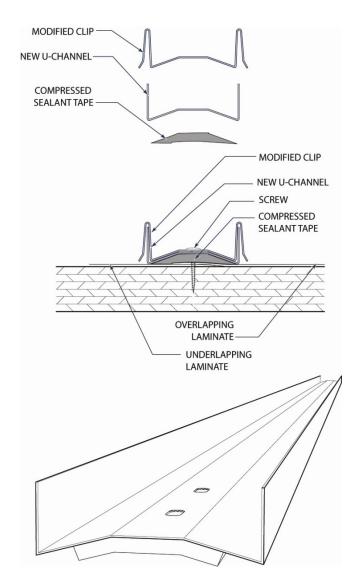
Design Rev. 2—improved clamping batten system Design with partially overlapping sealed edges
